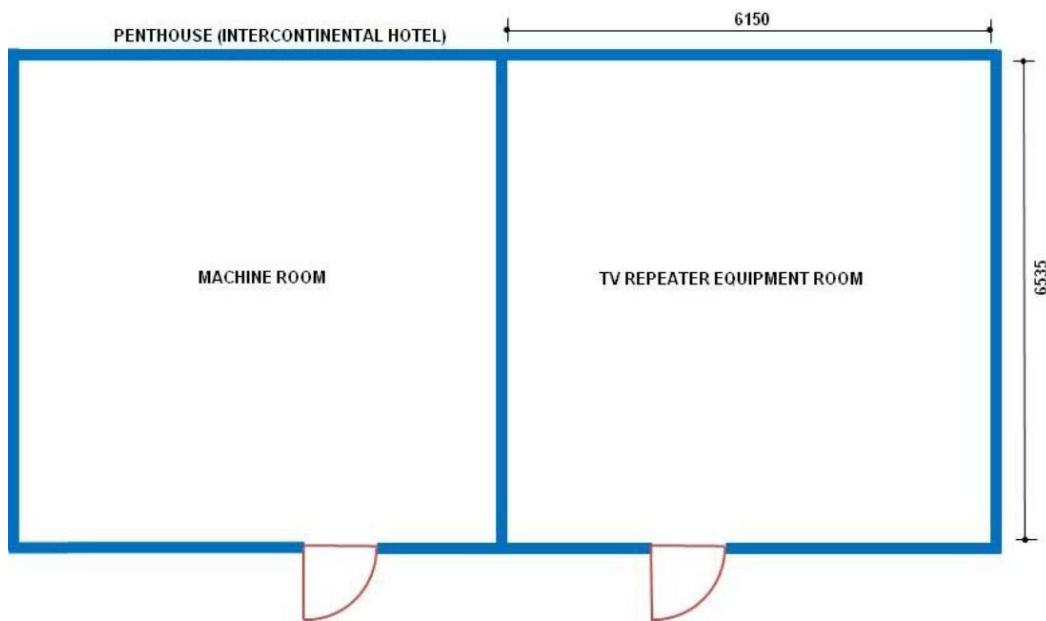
Kabul TV Repeater Site Plan
